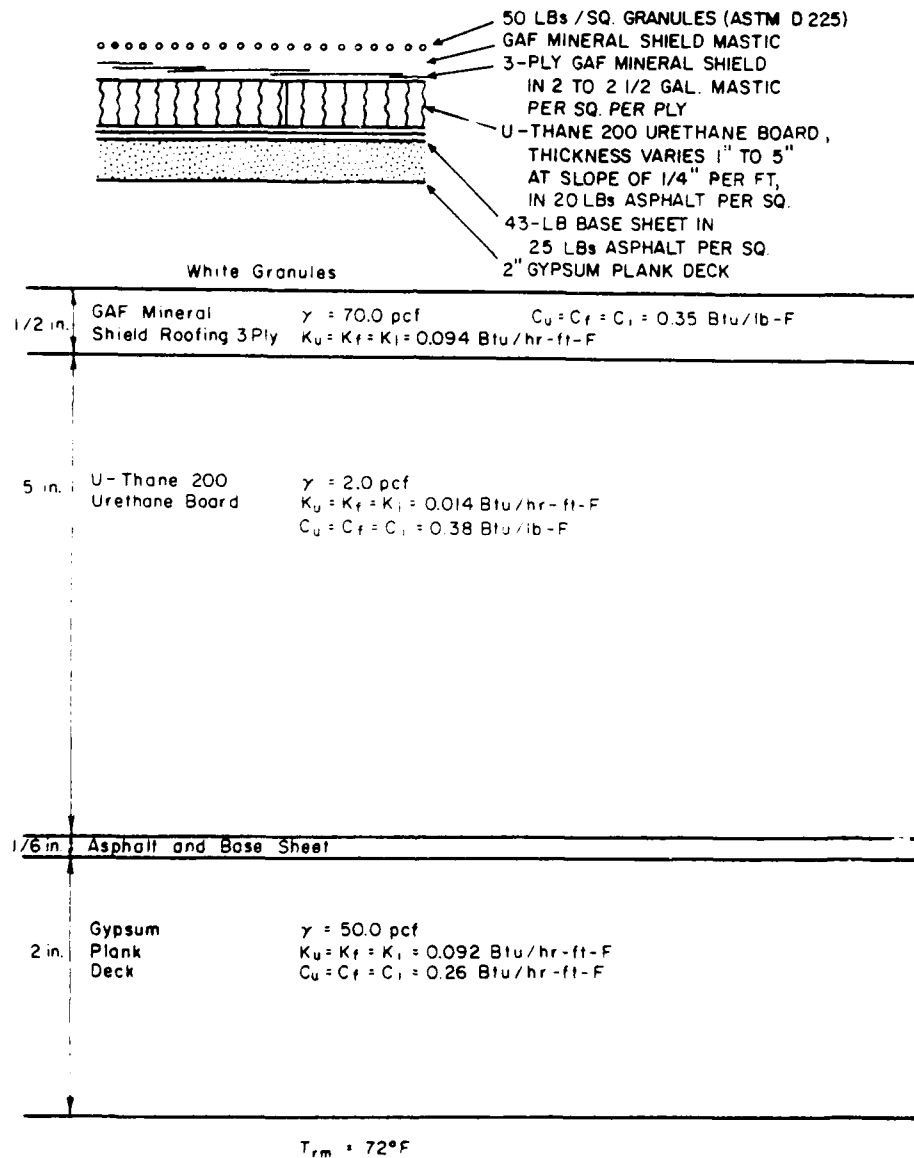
Roof System 4B, Building 4, Cape Hatteras, NC.
